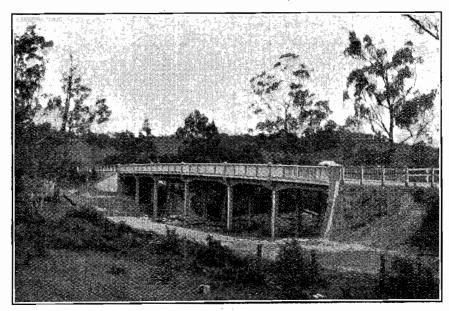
Bridge over Diamond Creek, Eltham.
